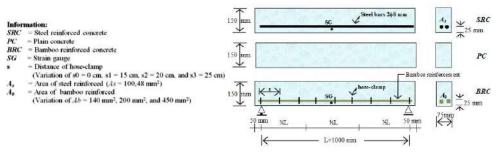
Detail and geometry of the bamboo reinforced concrete beam [1,2]
